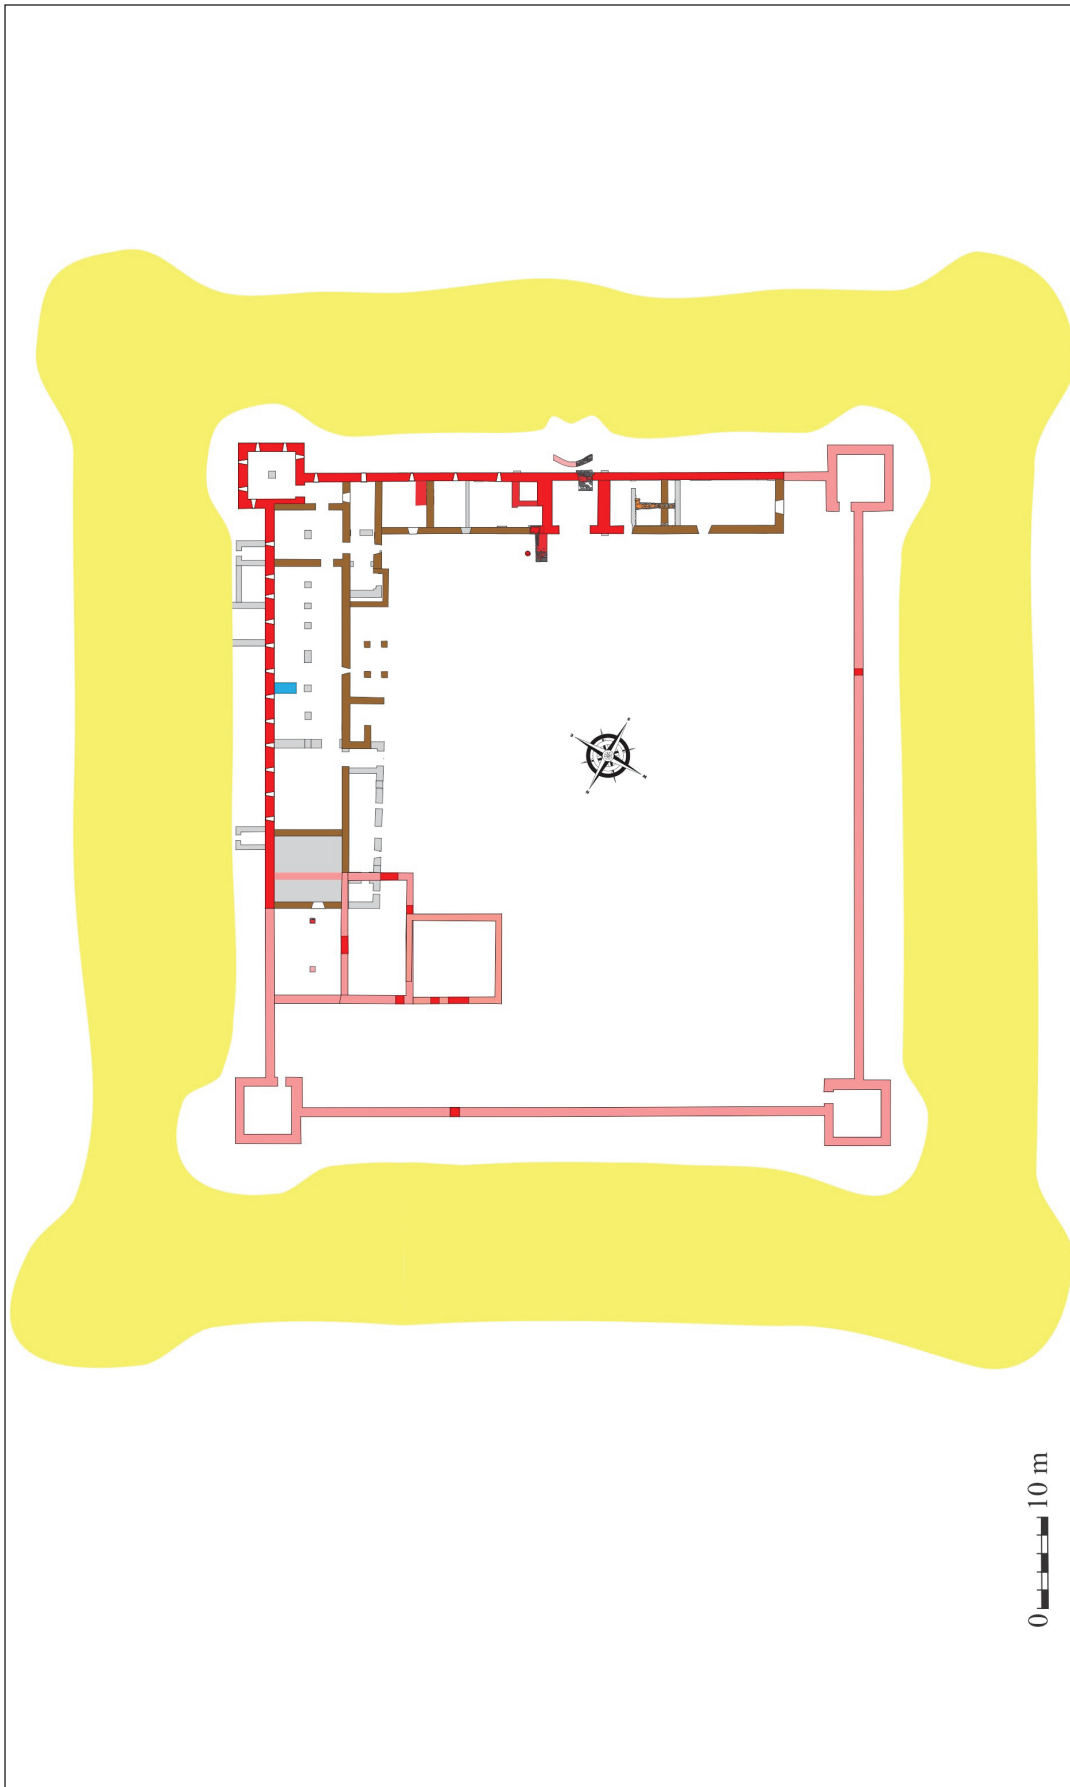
h century Renaissance castle with four corner towers, defensive structures, and 17th century additions.
